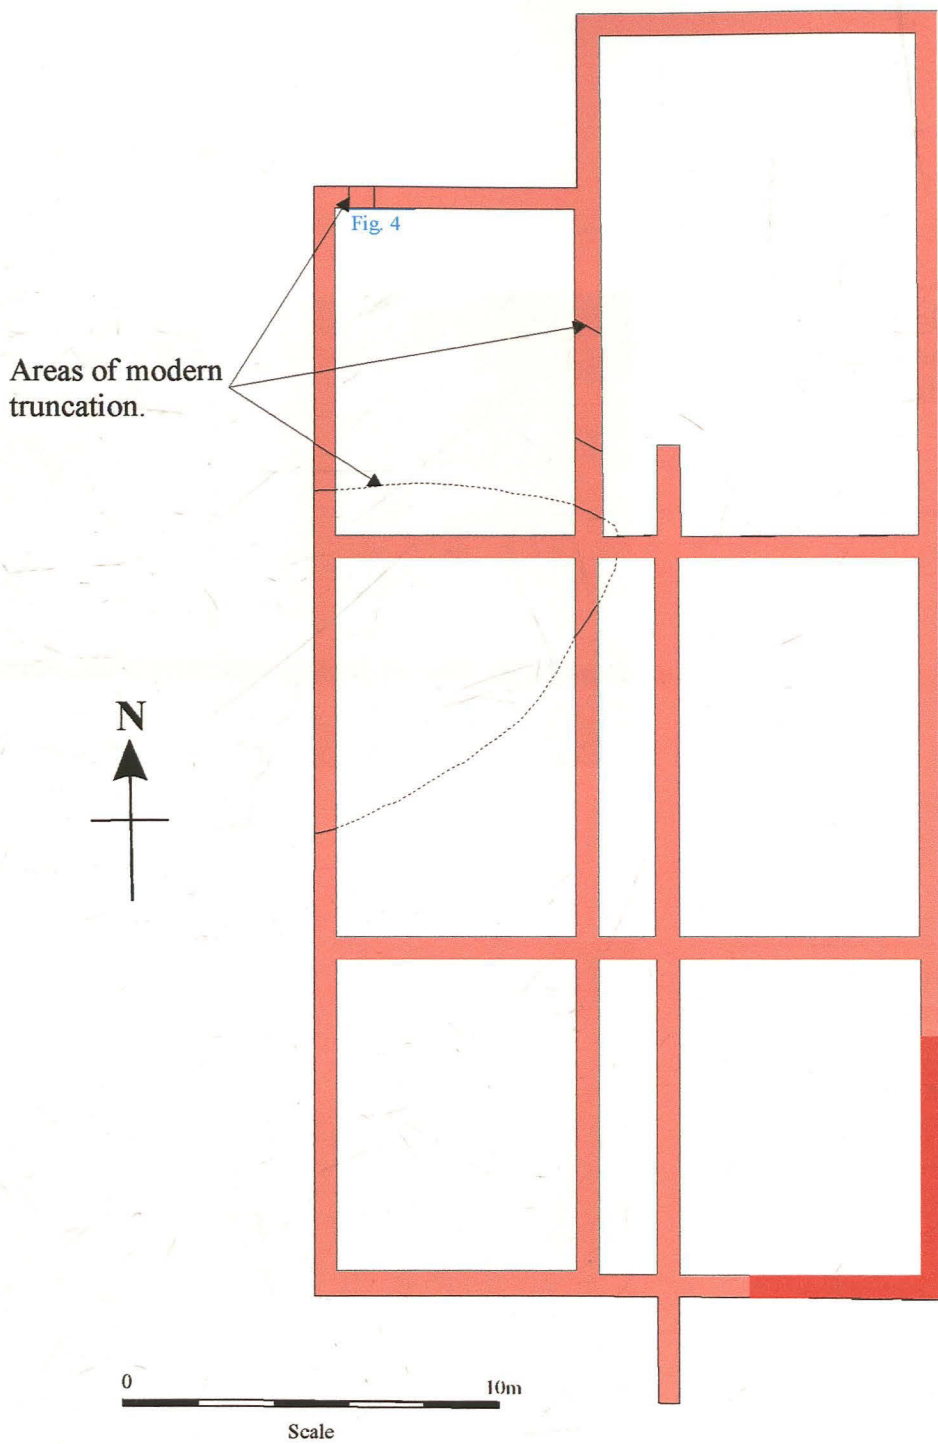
Layout of foundation trenches, showing area to the southeast that was not monitored. Also shown are 3 areas truncated by modern activity. 1:200
